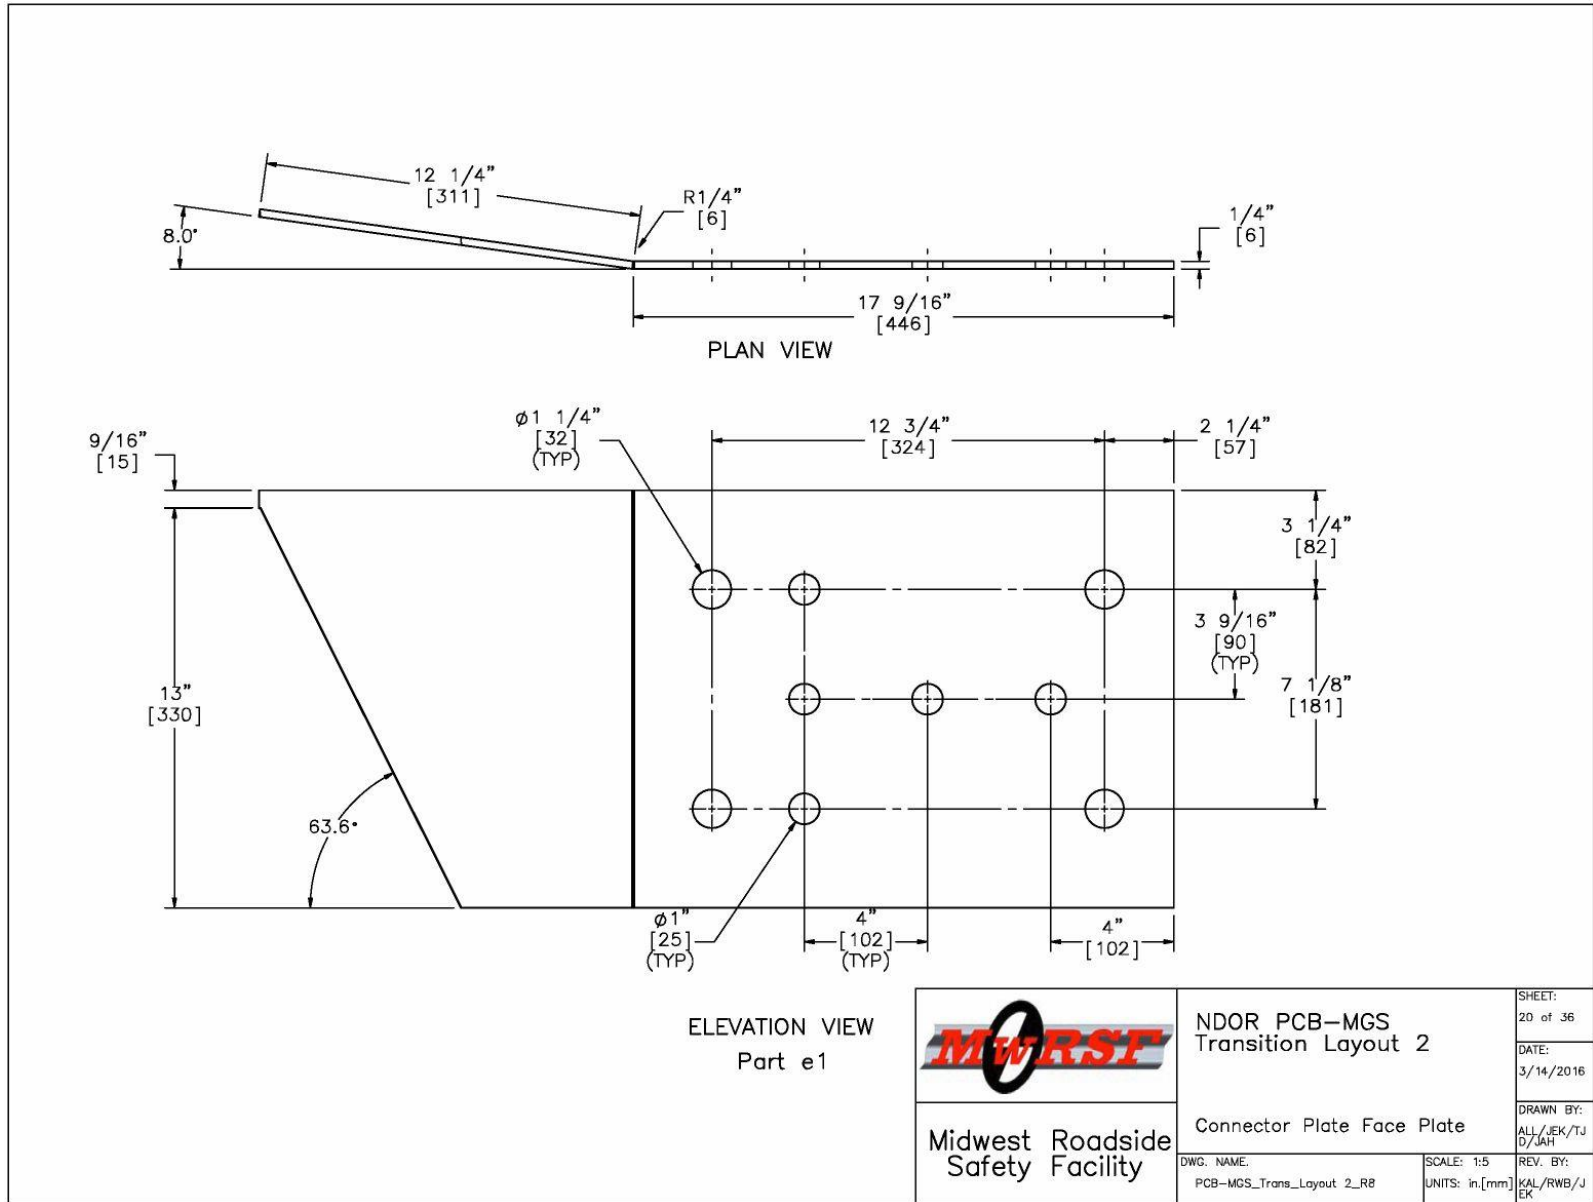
Connector Plate Face Plate, Test No. MGSPCB-1
